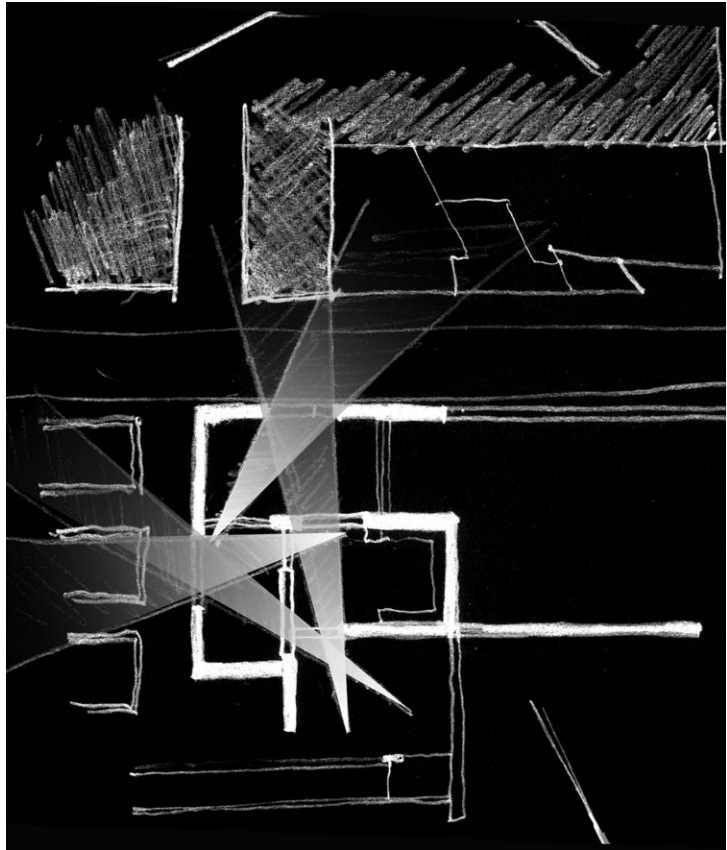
View of the Fountain Plaza side elevator lobby (Author)
